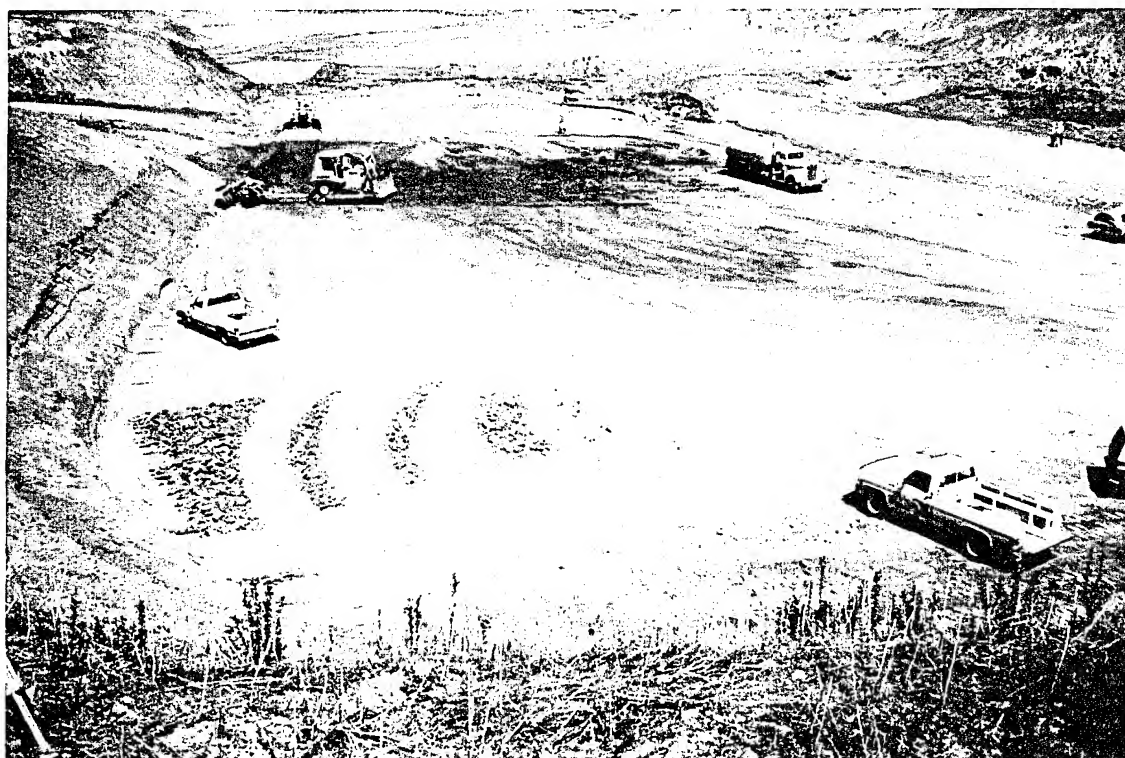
Looking upstream at the portion of the downstream shell foundation approved as "Area 051691A"
